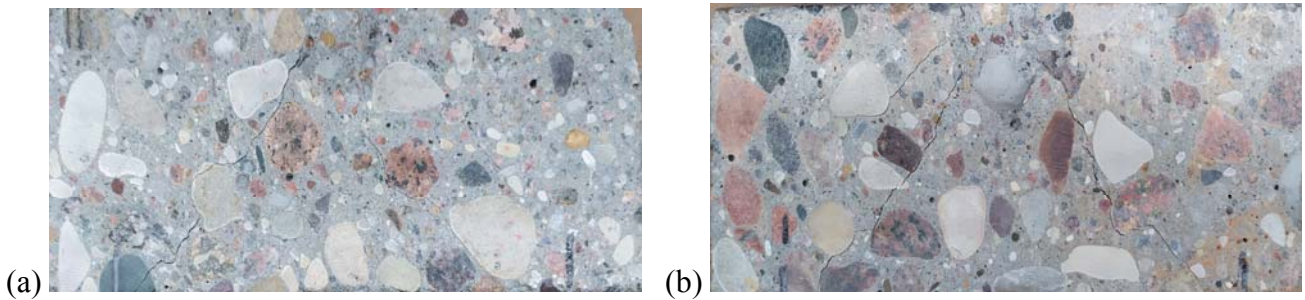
Crack patterns on the surface of concrete beams reinforced with basalt bars:
